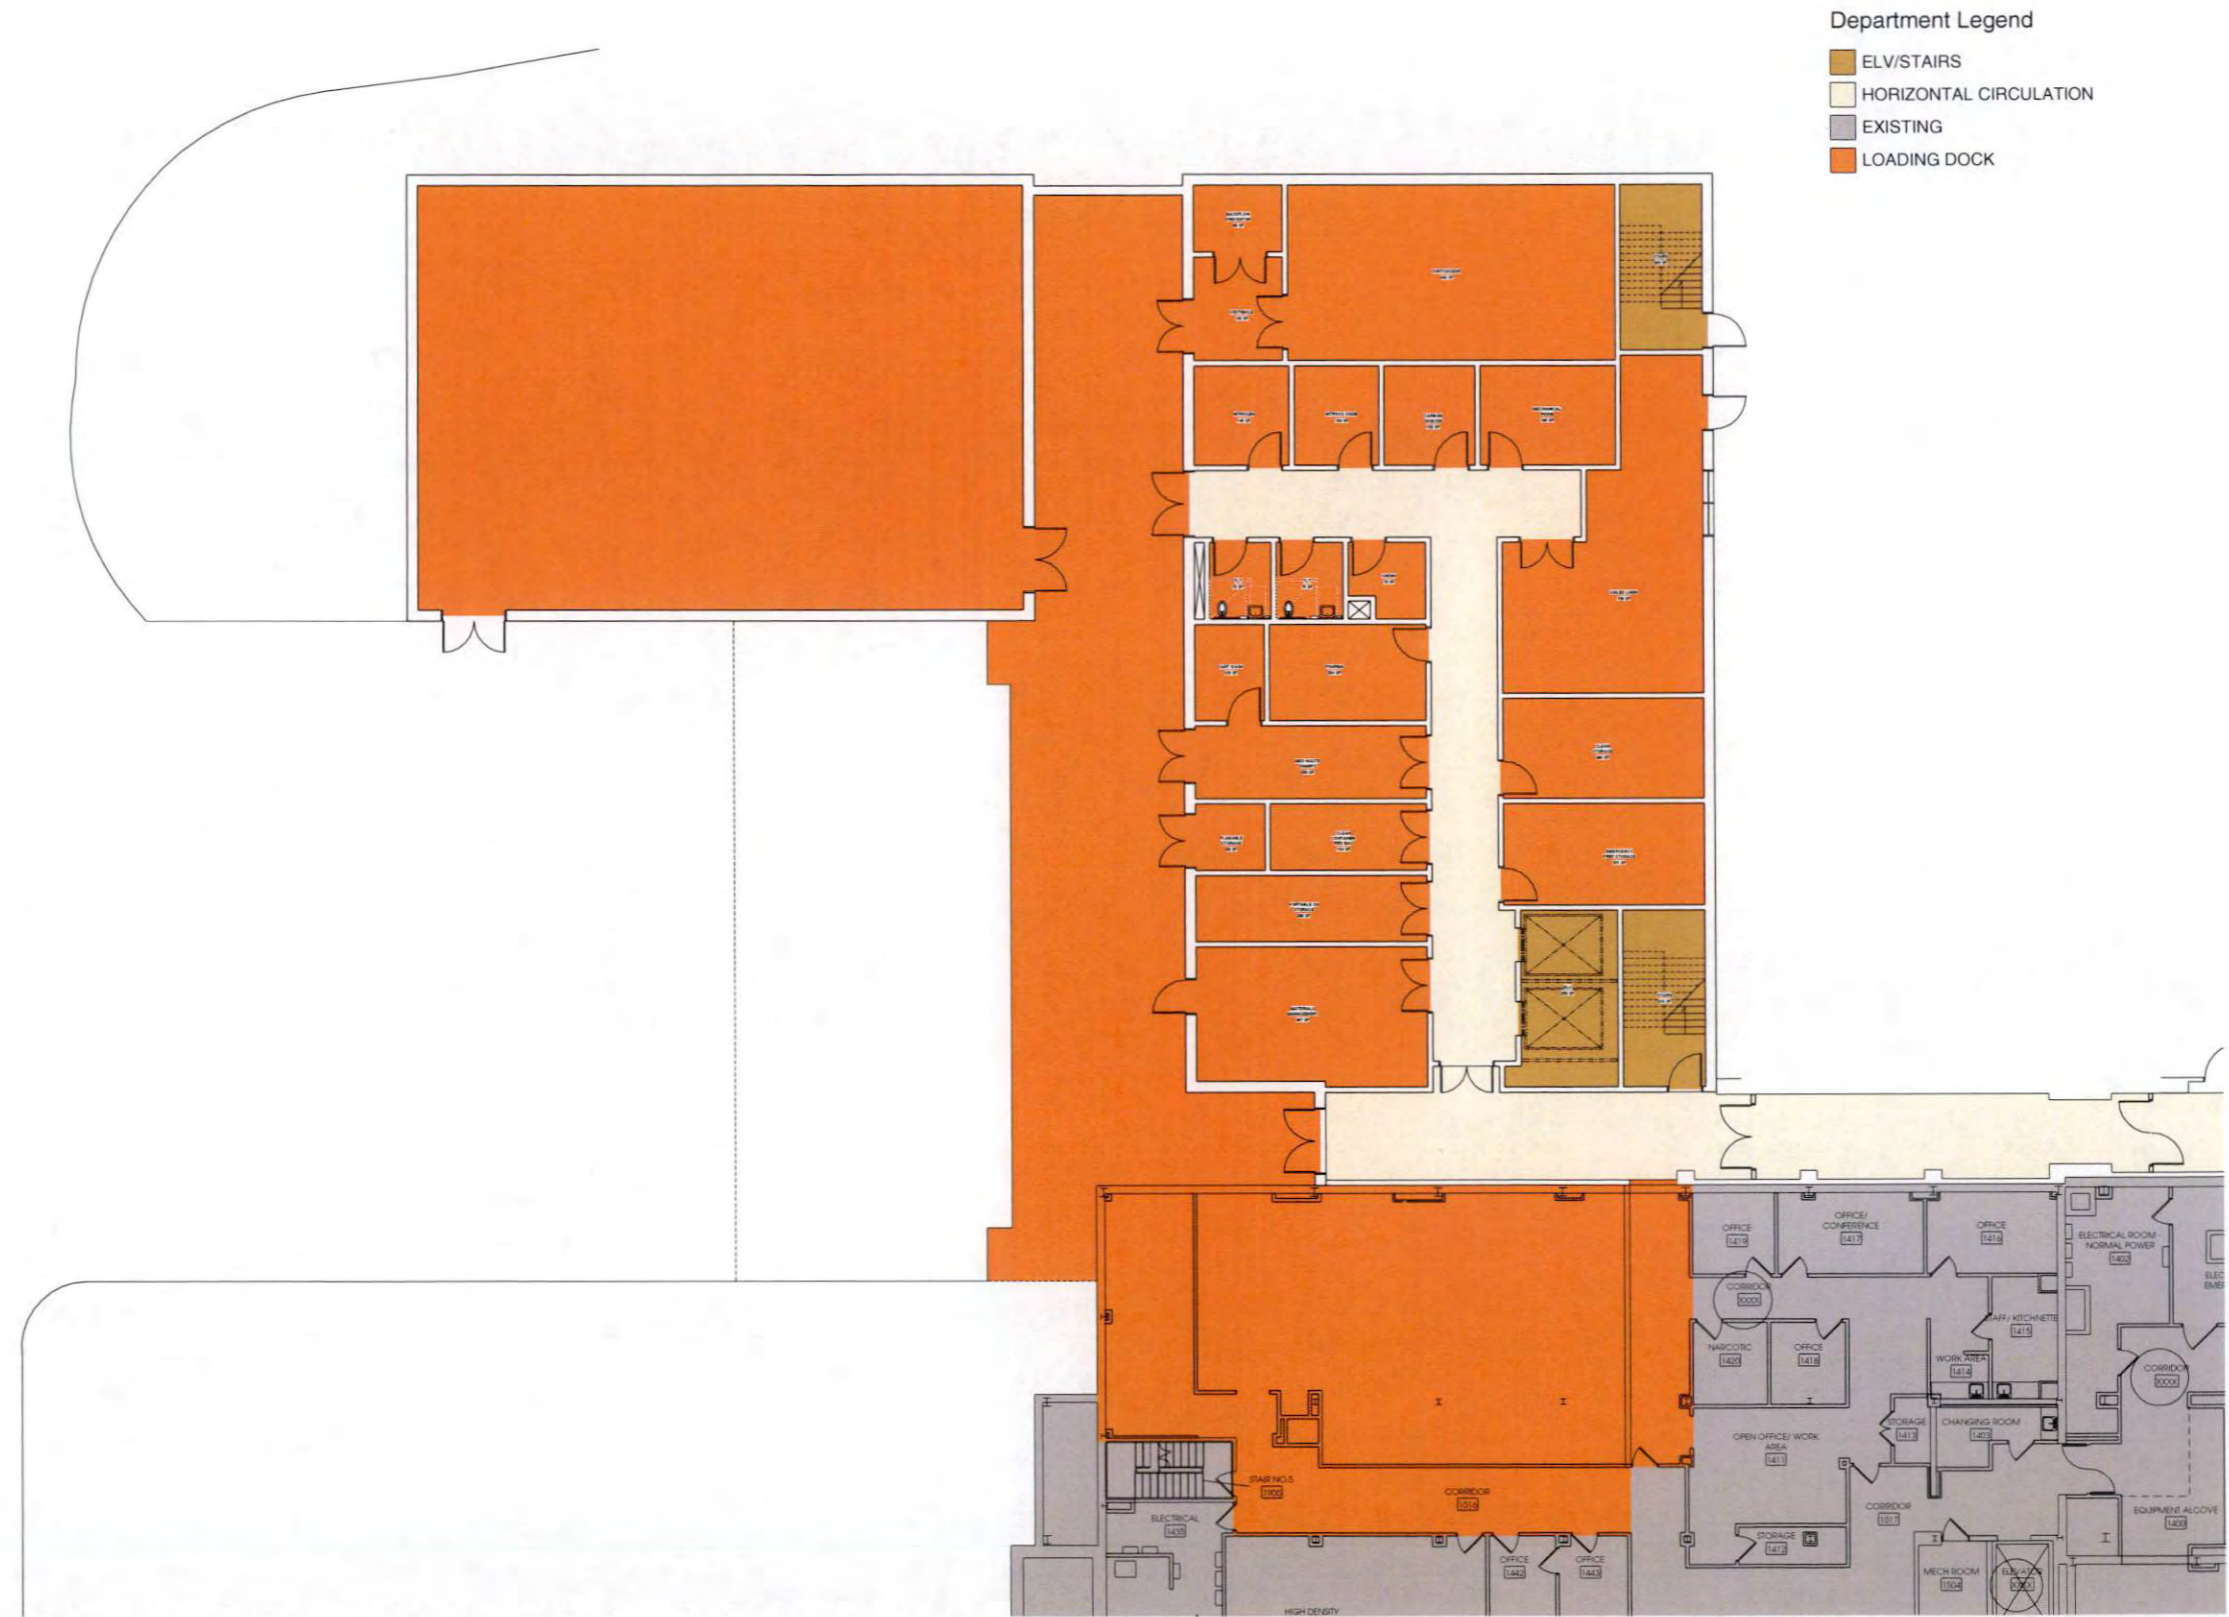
SECOND FLOOR LOADING DOCK EXPANSION
